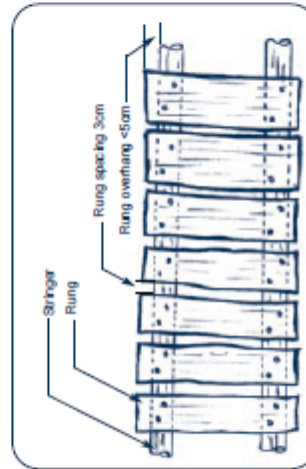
BRIDGE RUNG SPACING RUNG OVERHANG
